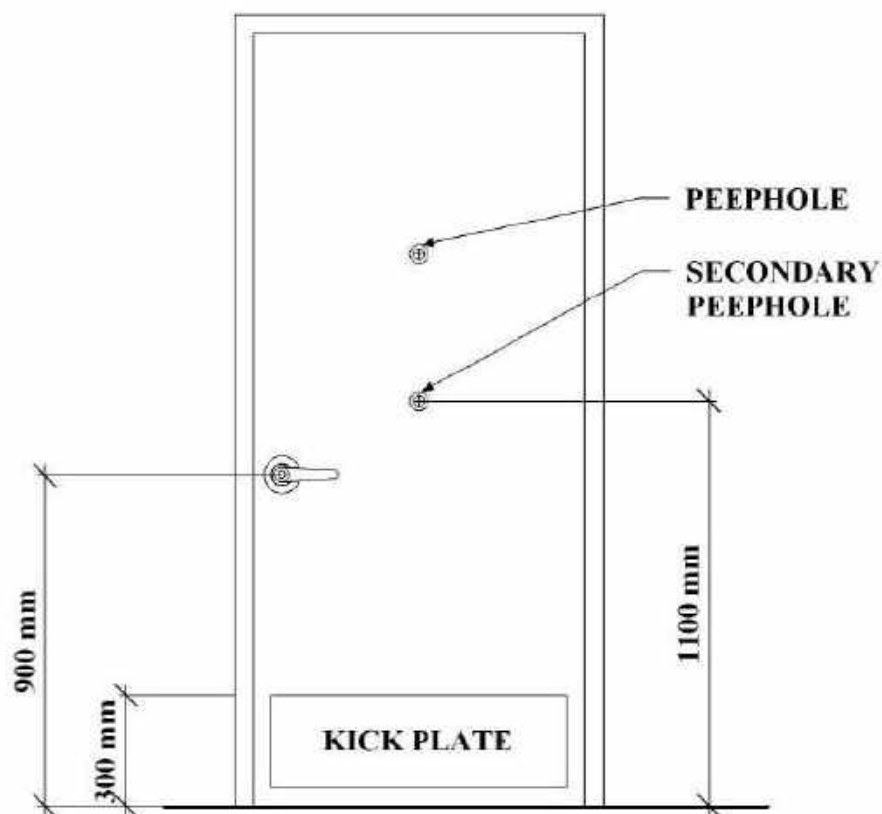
Image above shows a door installed with a secondary peephole for persons who use wheelchairs. The same door has a lever type lockset and a kick plate
